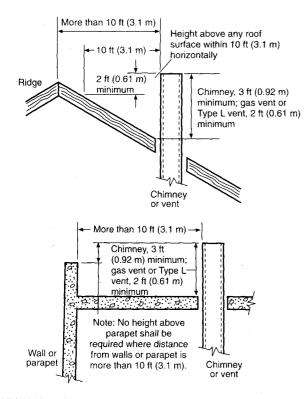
(b) Chimney or Vent Termination More Than 10 ft (3.1 m) from Ridge, Wall, or Parapet.
